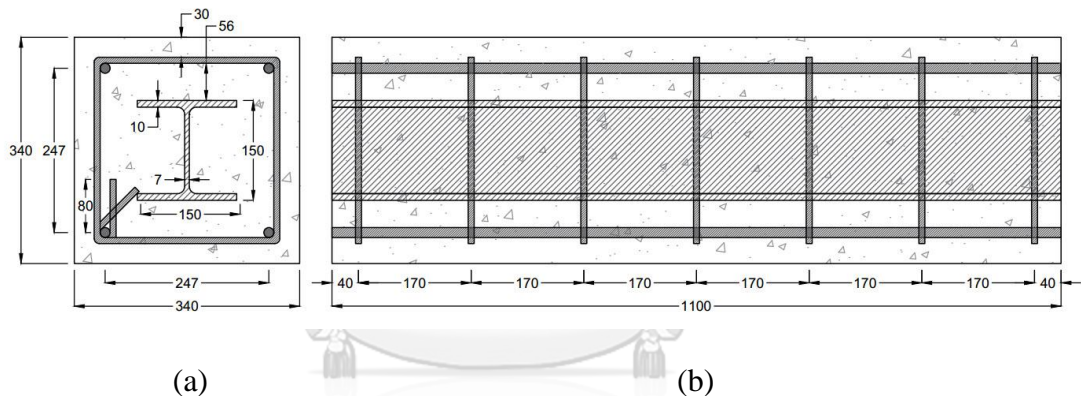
Reinforcement details of W-170 (A) and W-170 (B) columns;
